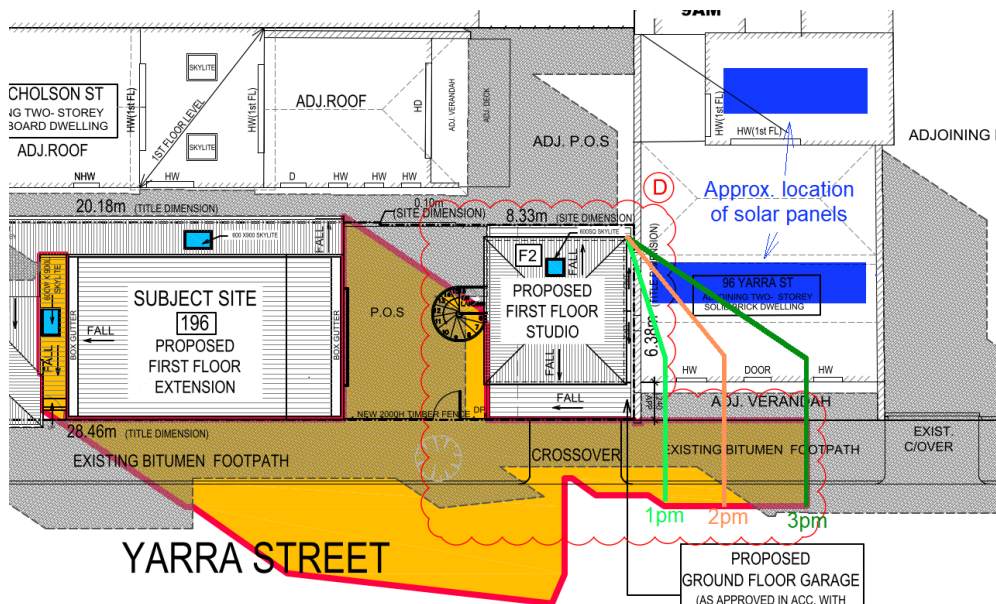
3pm shadow diagram with 1pm, 2pm and 3pm shadows drawn and labelled on the plan, including location of adjoining solar panels at No. 96 Yarra Street drawn in blue (Applicant Submission 4 March 2021 with Council's Planning Officer's annotations)
